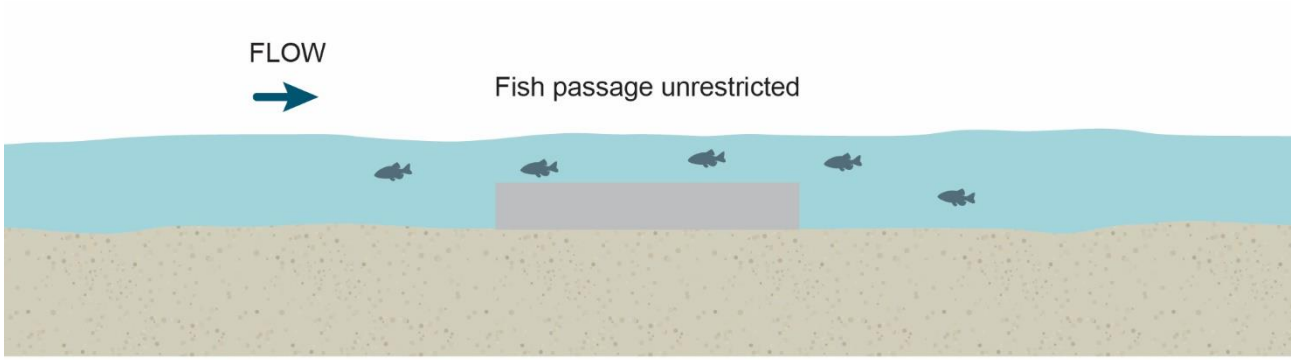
Causeway or culvert crossing is drowned out (long-section of waterway)
